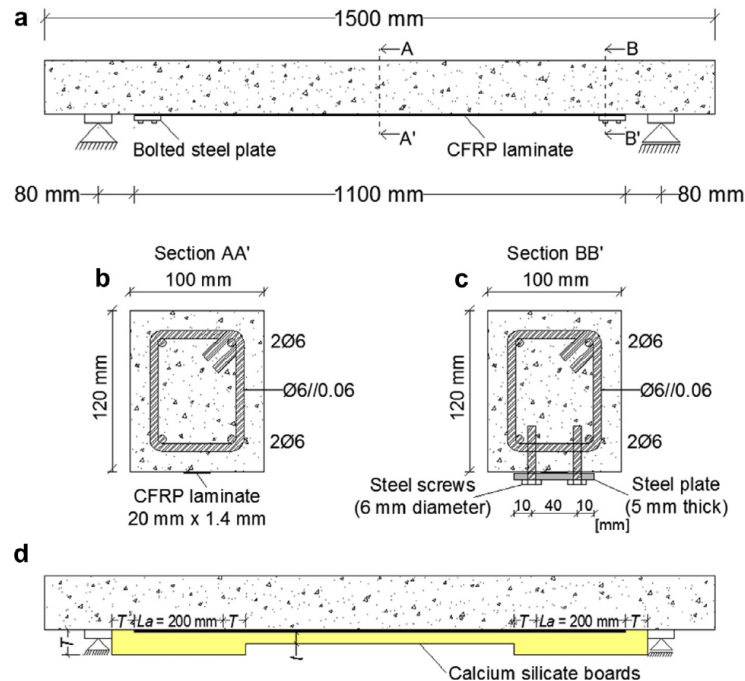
Geometry of the test specimens: (a) longitudinal view of the specimen with mechanical anchorages on the CFRP extremities; (b) current cross-section; (c) cross-section with mechanical anchorage; (d) longitudinal geometry of the fire protection system [57]
